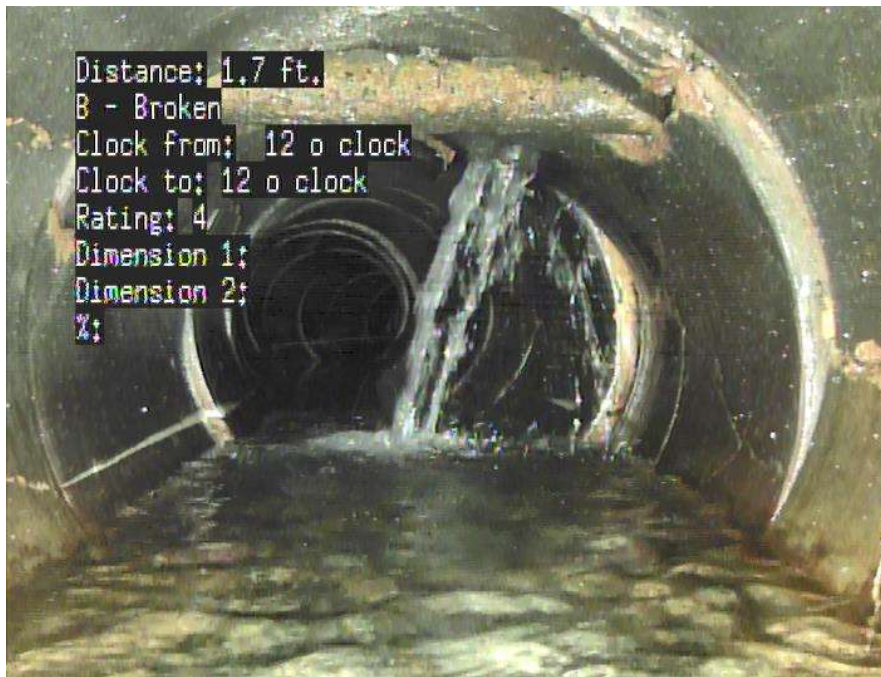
Example of Water Leak Intrusion to Drainage Pipe
